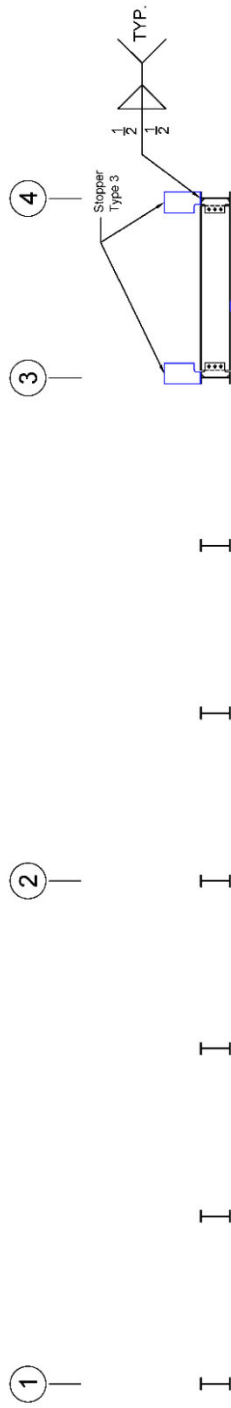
Plan View of Stopper Layouts (DWG NS19)
